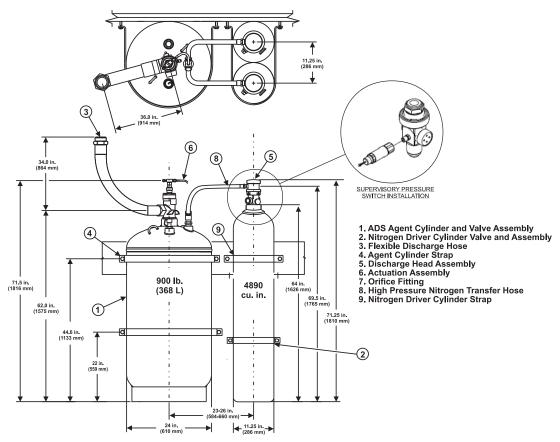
Dual Driver Installation, Vertical Mounting for 900 lb. (368 L) Systems
